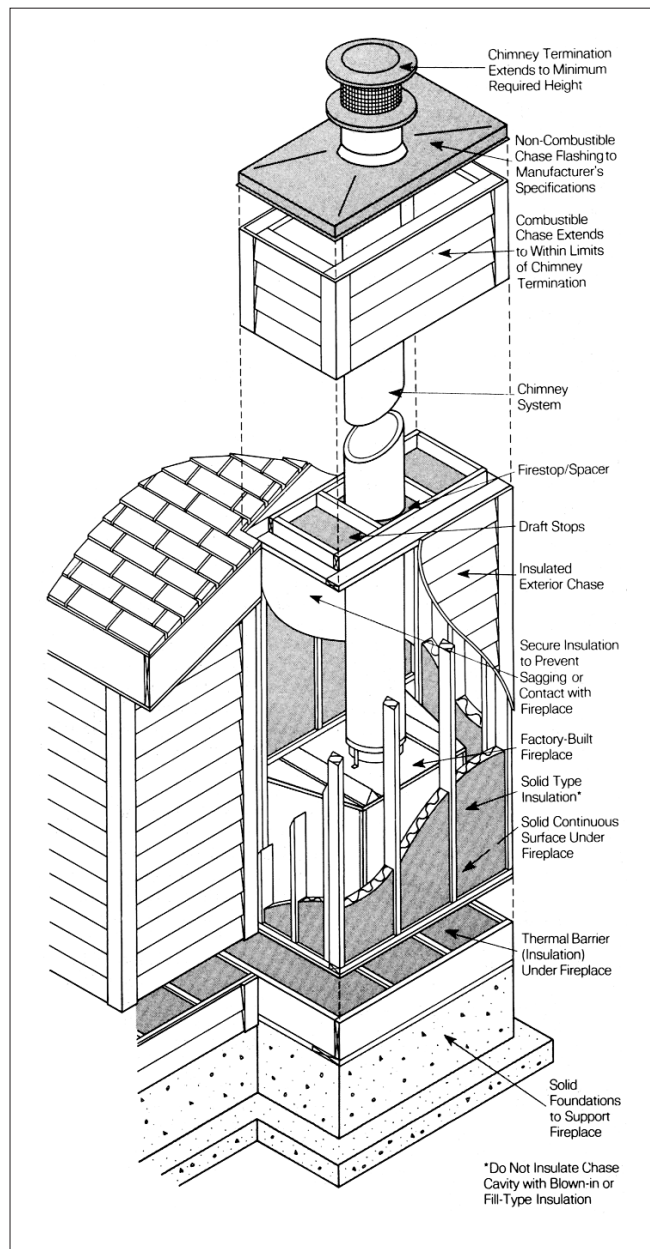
An exterior chase should be constructed with typical stud walls following the details specified in the installation instructions. Pay careful attention to attaching the chase structurally to the house.
